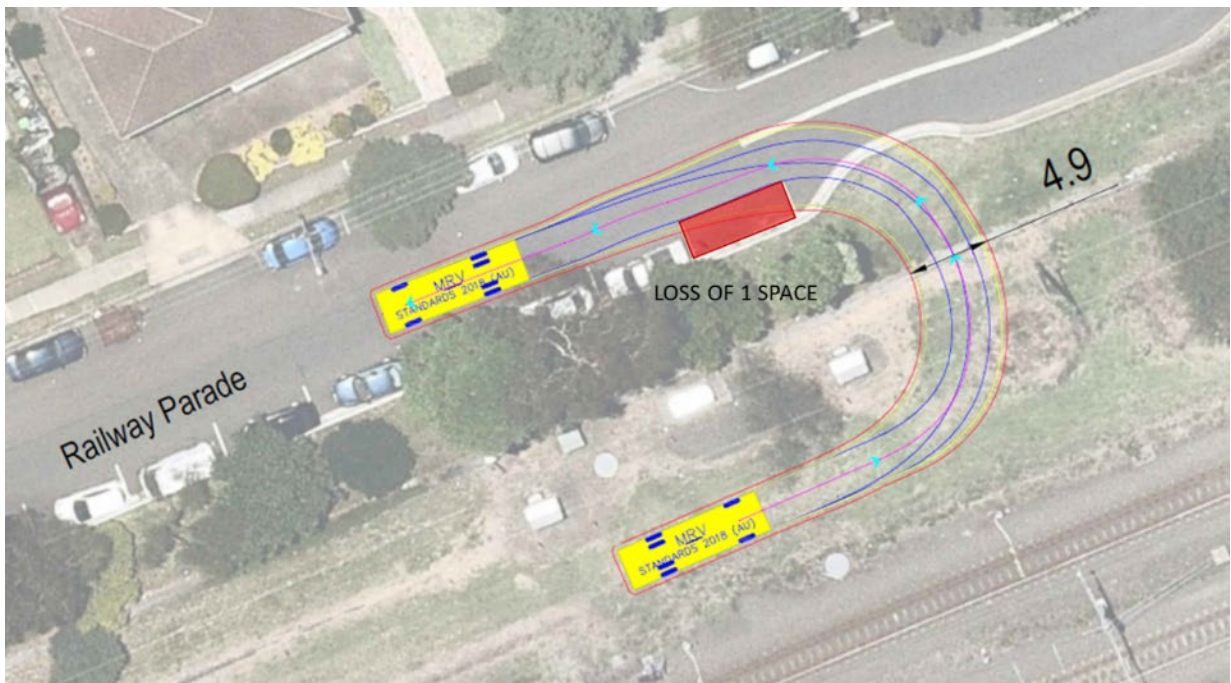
LA6 – M24 14.943D Parking Space Loss
